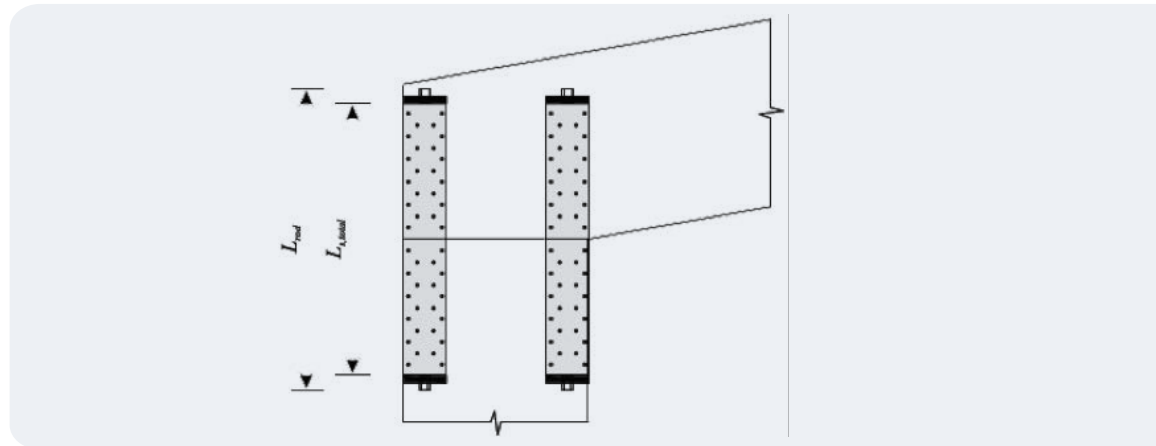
Dimensions used in determining the deflection of the rod assembly.
